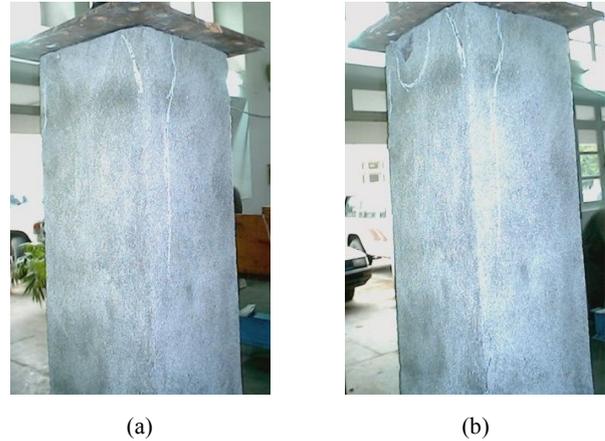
Cracks in ferrocement encased specimen (a) initiation of first crack and (b) development of multiple cracks
